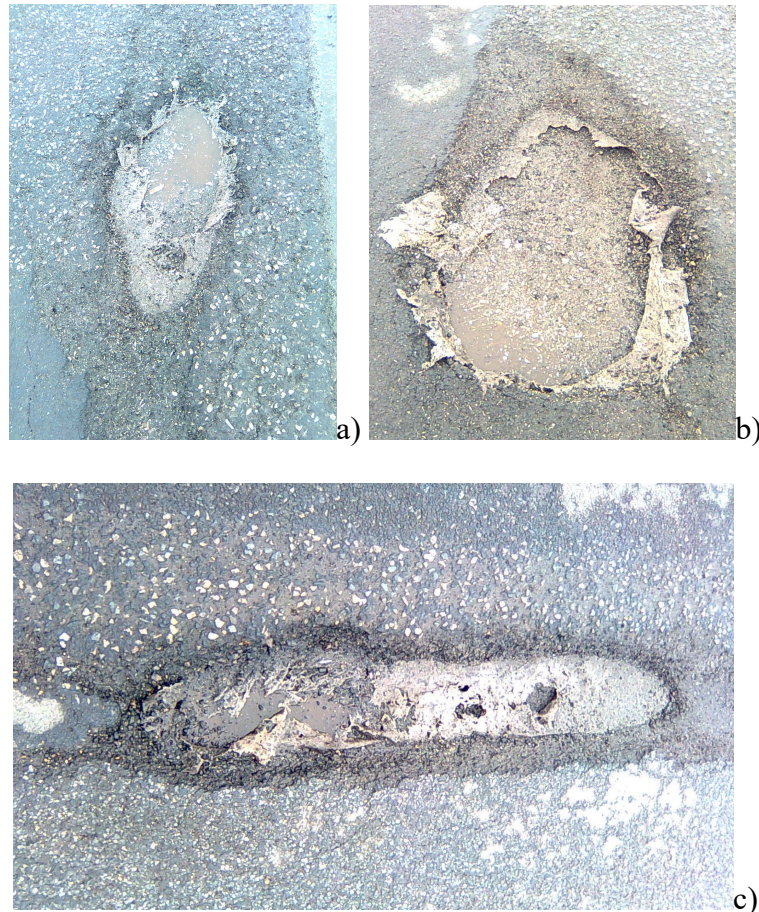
depicts a damaged section of an asphalt concrete road lane with visible water solution stagnation in pavement voids that reach down to the base layer.
